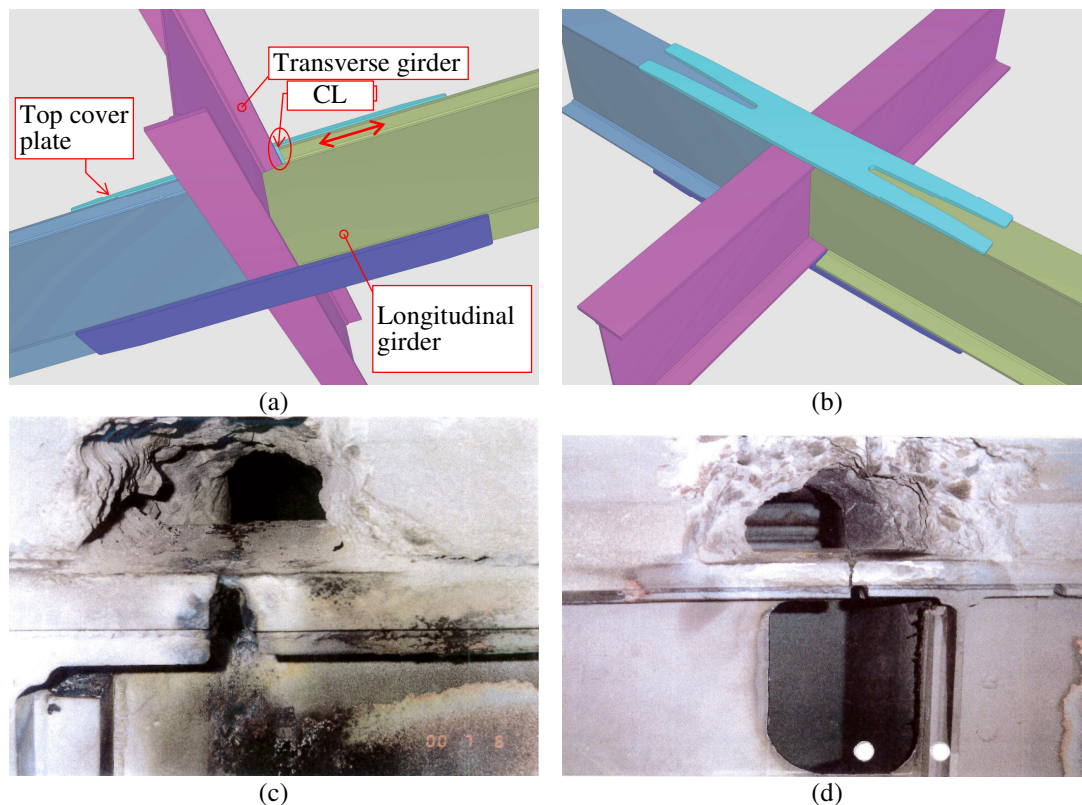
Critical detail at viaduct part of the bridge. (a) continuity of longitudinal girder is interrupted at the support location by transverse girder. Top and bottom cover plates are provided to transfer the moment. Cracking location is shown as “CL” (view from below the deck); (b) View from top; (c)&(d) Cracked top cover plates at support locations N7 and N9.
